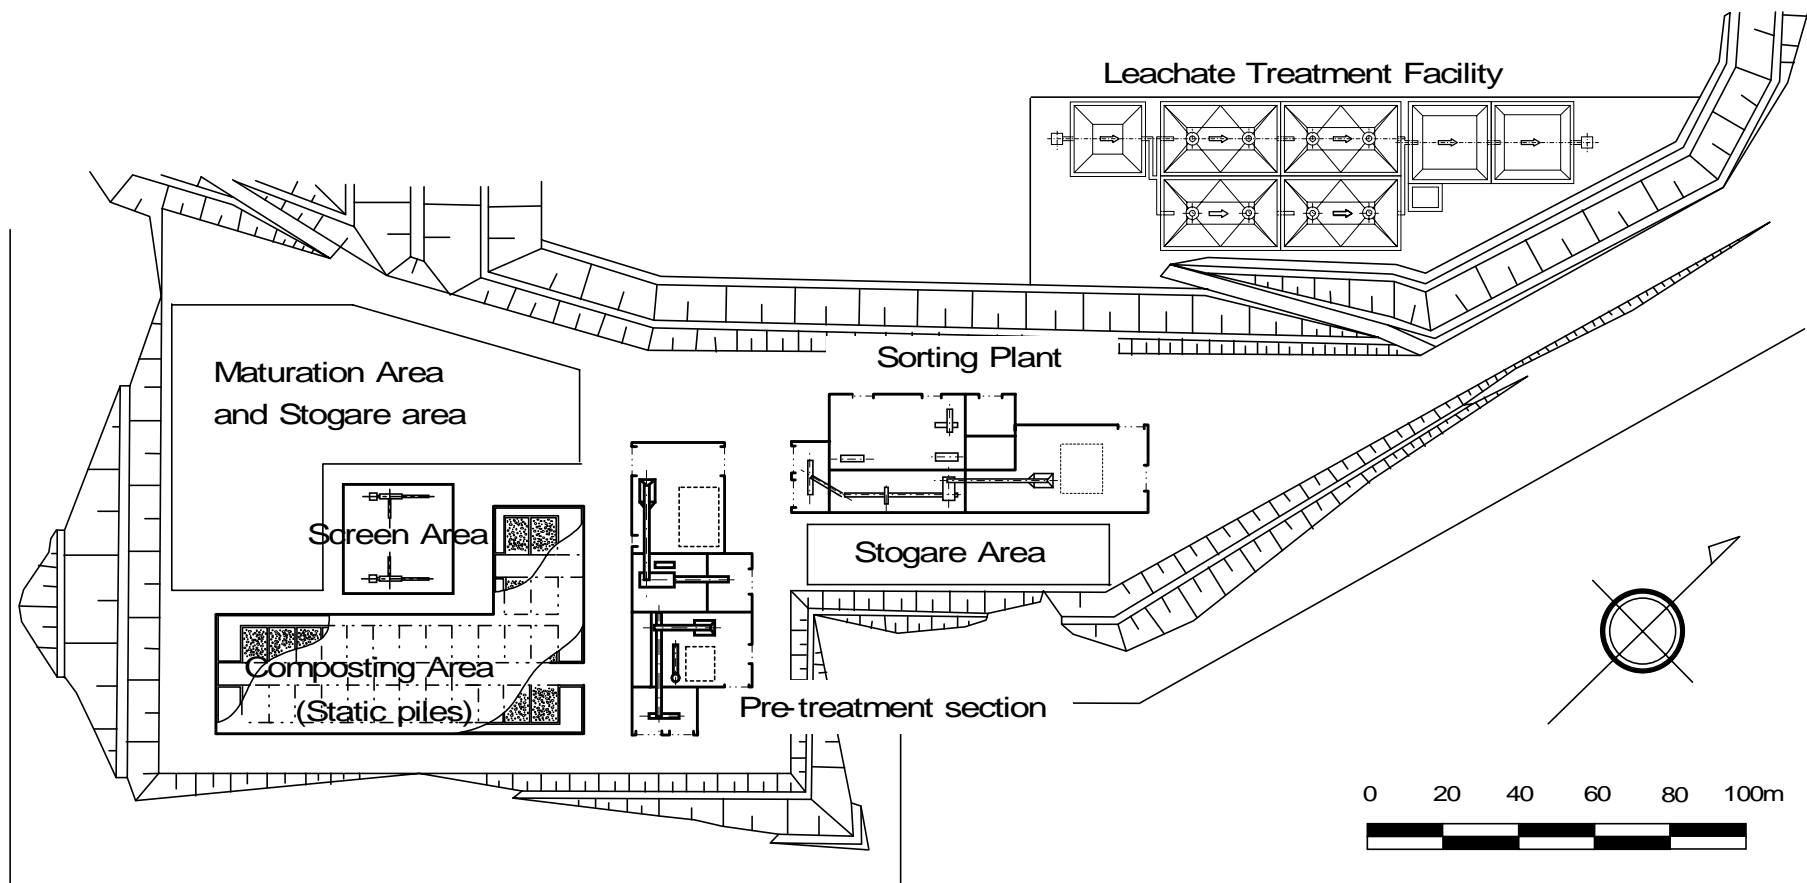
Layout of Proposed Compost Plant in Cimsa
